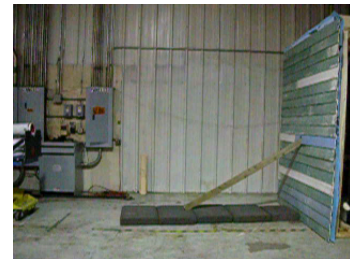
Wall 1 (Insulating Sheathing + Housewrap) fail at 50 fps
